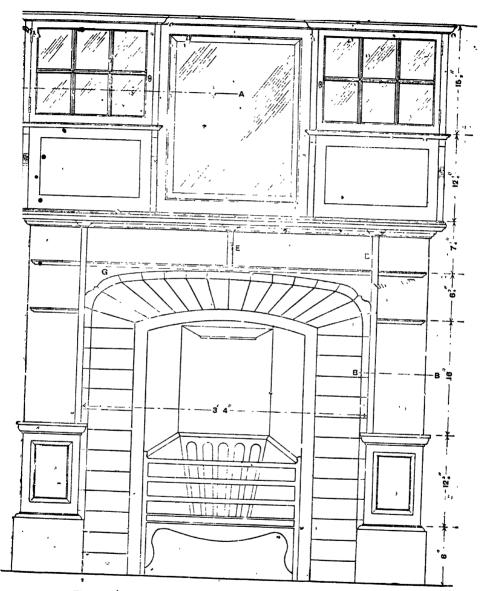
Elevation Plan of Chimney-piece and Cupboard Overmantel.
